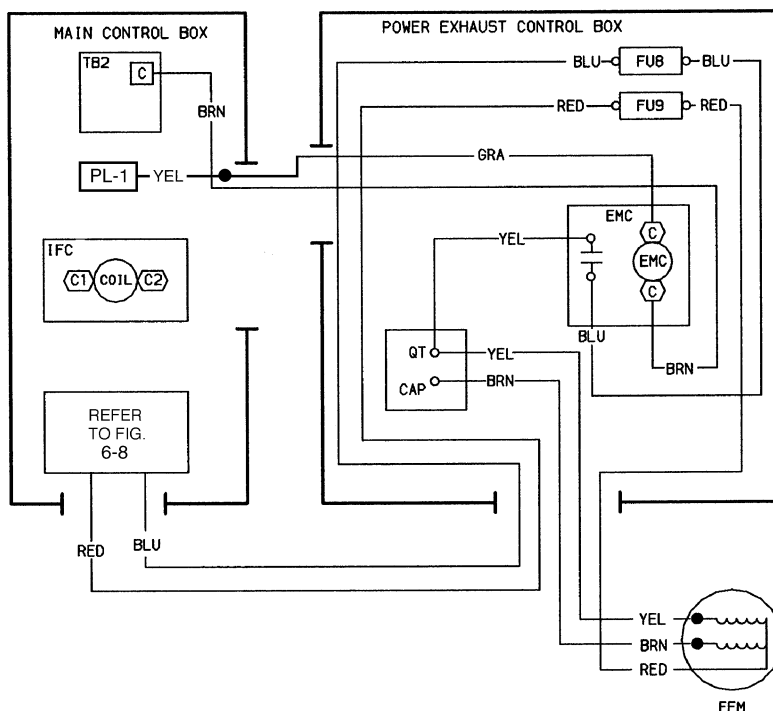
Accessory Power Exhaust Package Installed on Base Unit
